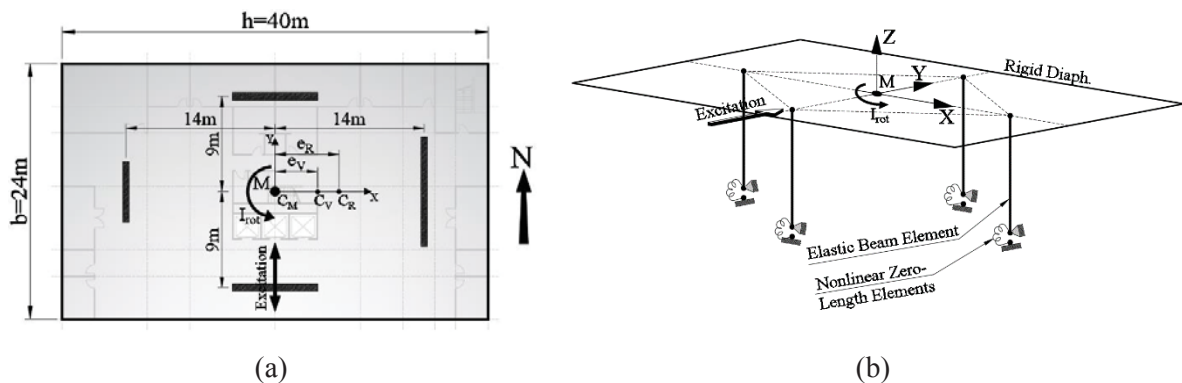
(a) Plan view of the torsionally irregular case study building (b) Structural Model.
